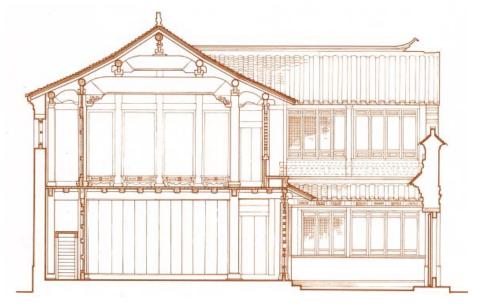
"Schematic diagram showing the construction of a domestic house built in the Ming Dynasty in Wu County, Jiangsu" - Similar side building section to Zhang Guying Dang Damen main house, from History and development of ancient Chinese architecture, 1986, p.134
